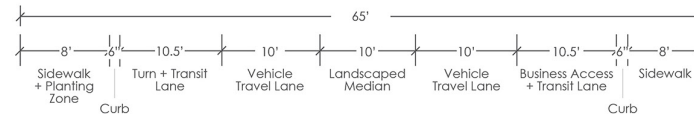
Typical Sections for Main Street from South 5th Street to Eastland Avenue
